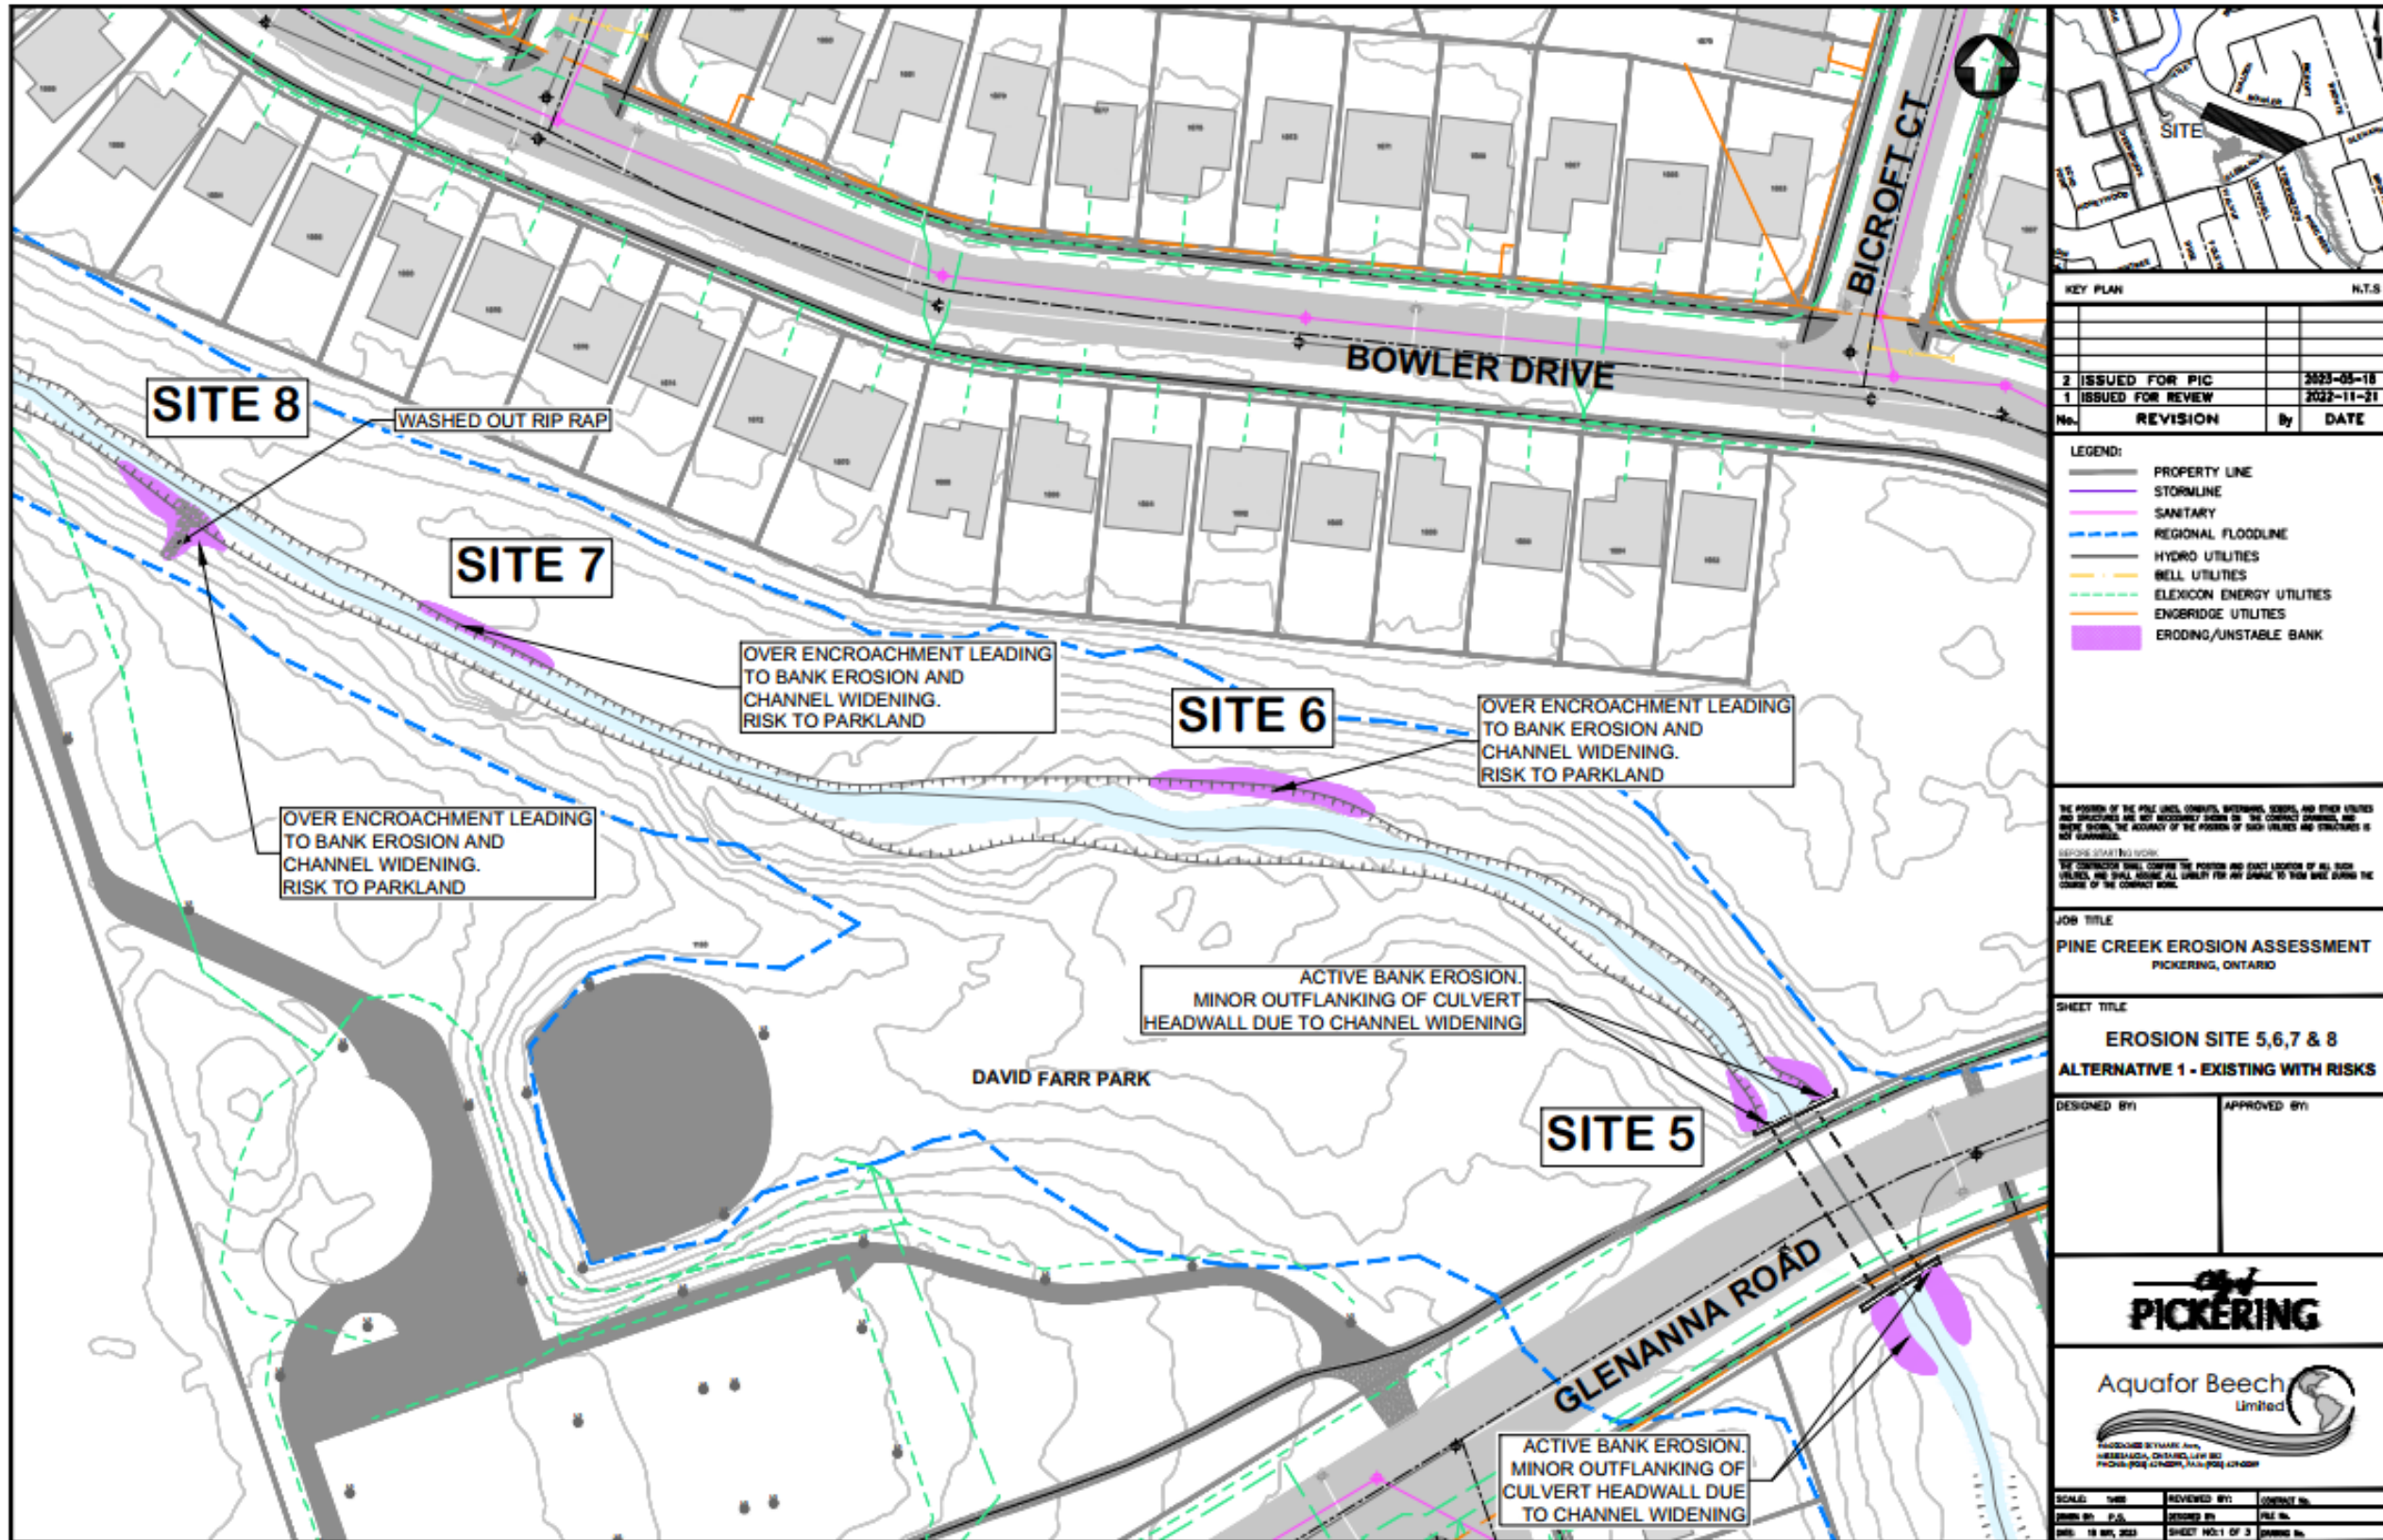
Erosion Site #5-8: Existing Site Conditions
